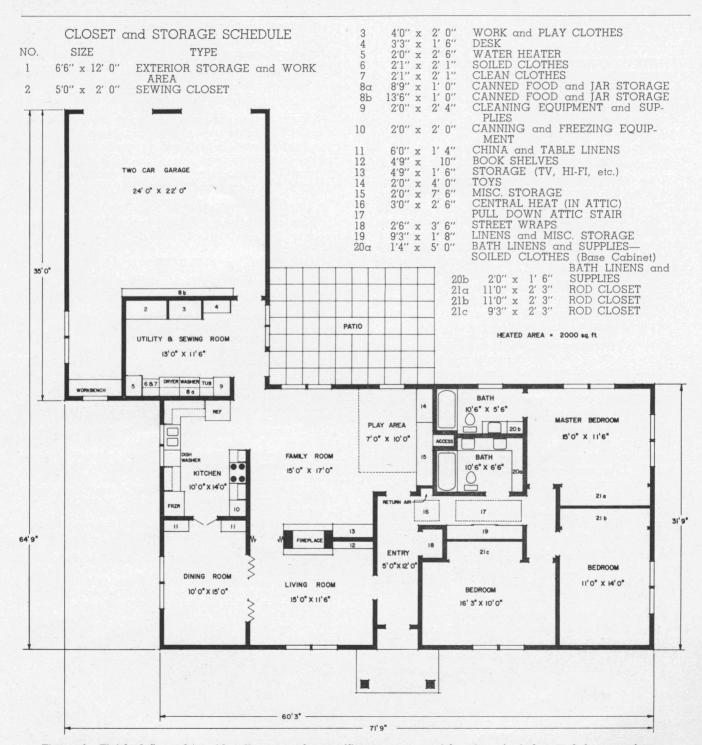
Finished floor plan with adjustments for specific space use and location of window and door openings.
